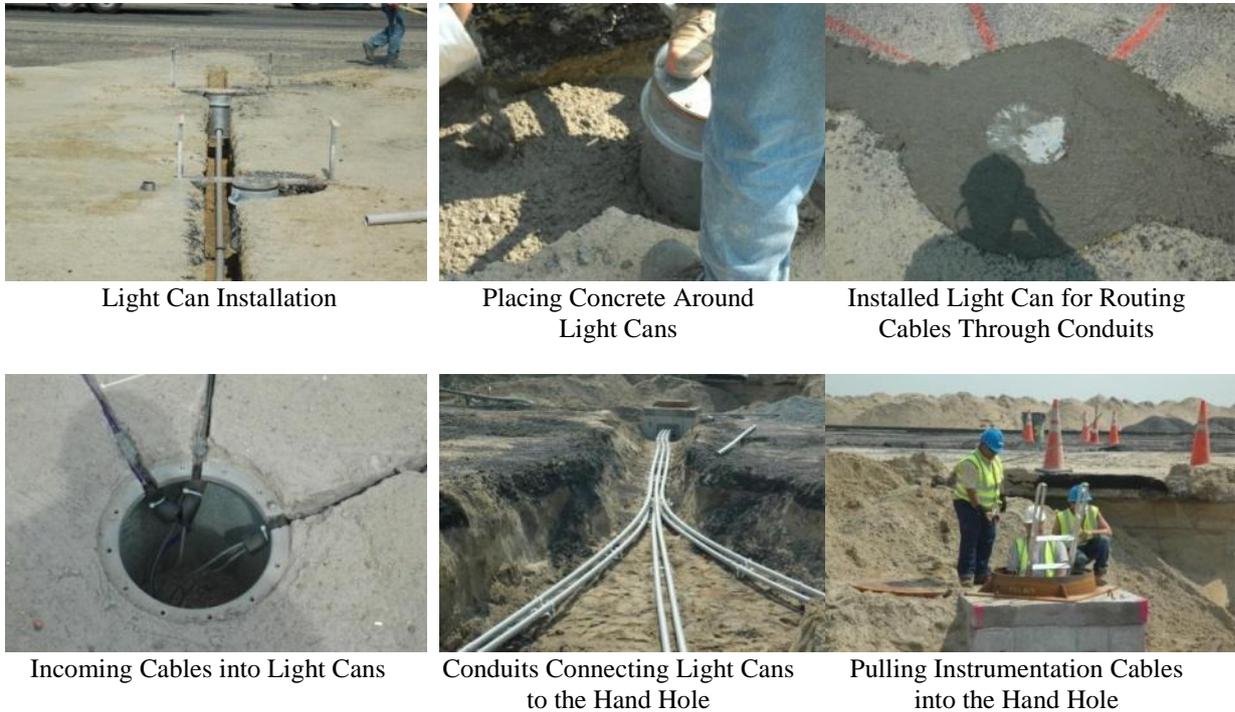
Routing Instrumentation Cables from PCC Slabs to a Hand Hole Located 150 feet (45.7 m) from Taxiway-Z Edge.
